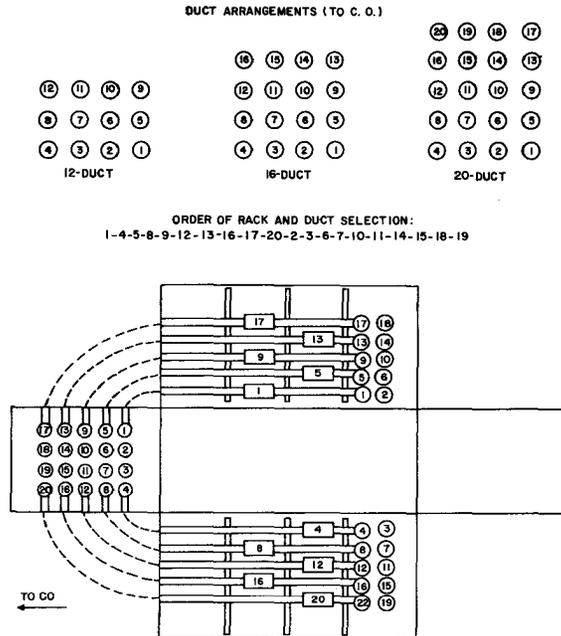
Type T Manhole—6-Foot Wide—20-Duct Capacity—4-Wide Configuration
